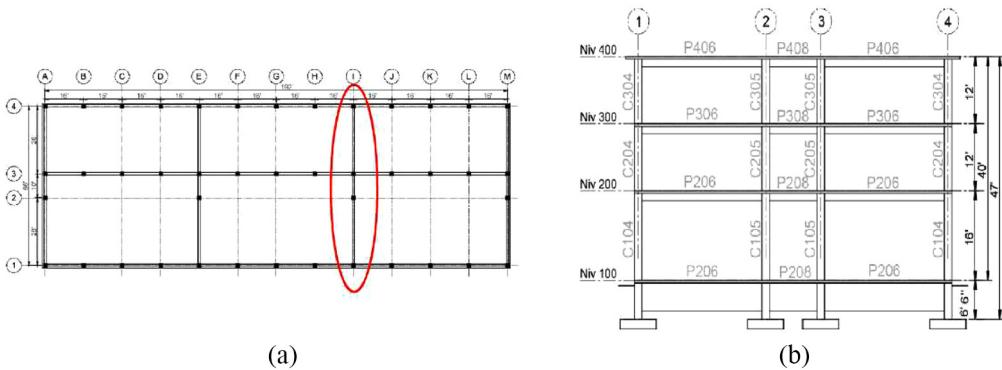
(a) Floor plan (Apari and Lauzier, 2016) and (b) elevation view of building studied.
